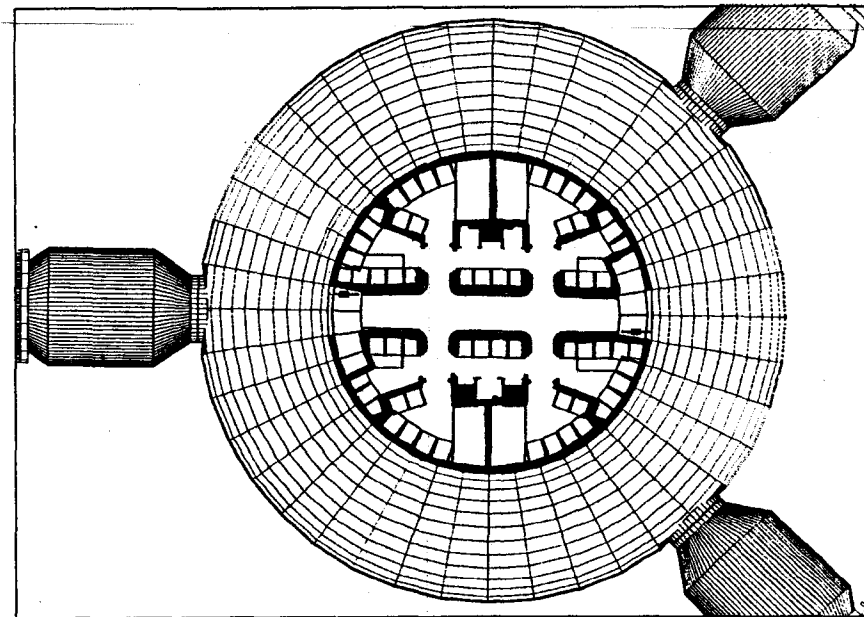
Floorplan of Domus I with lower level of dome illustrating the crew quarters and hygiene facility.
